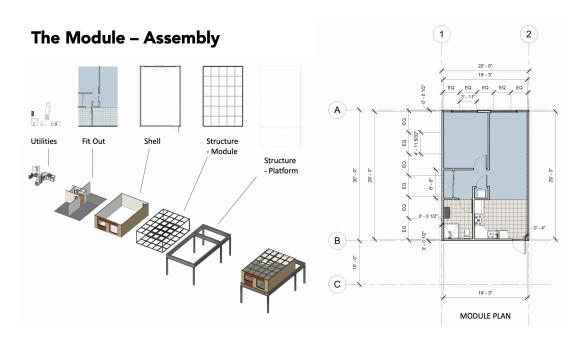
Left images: Diagram of the construction of a module and its placement on the base structural platform. Right image: floor plan of a typical one-bedroom residential module. (Source: Author)
